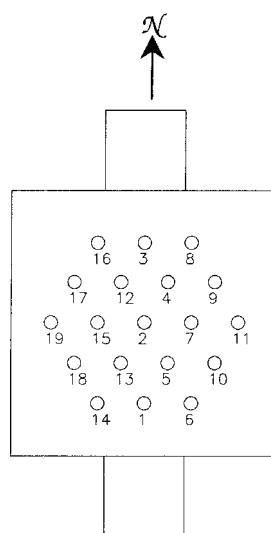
Orientation of western grout containment units (17-3 and 17-4) at Soil Vault Row 17 disposal locations.
